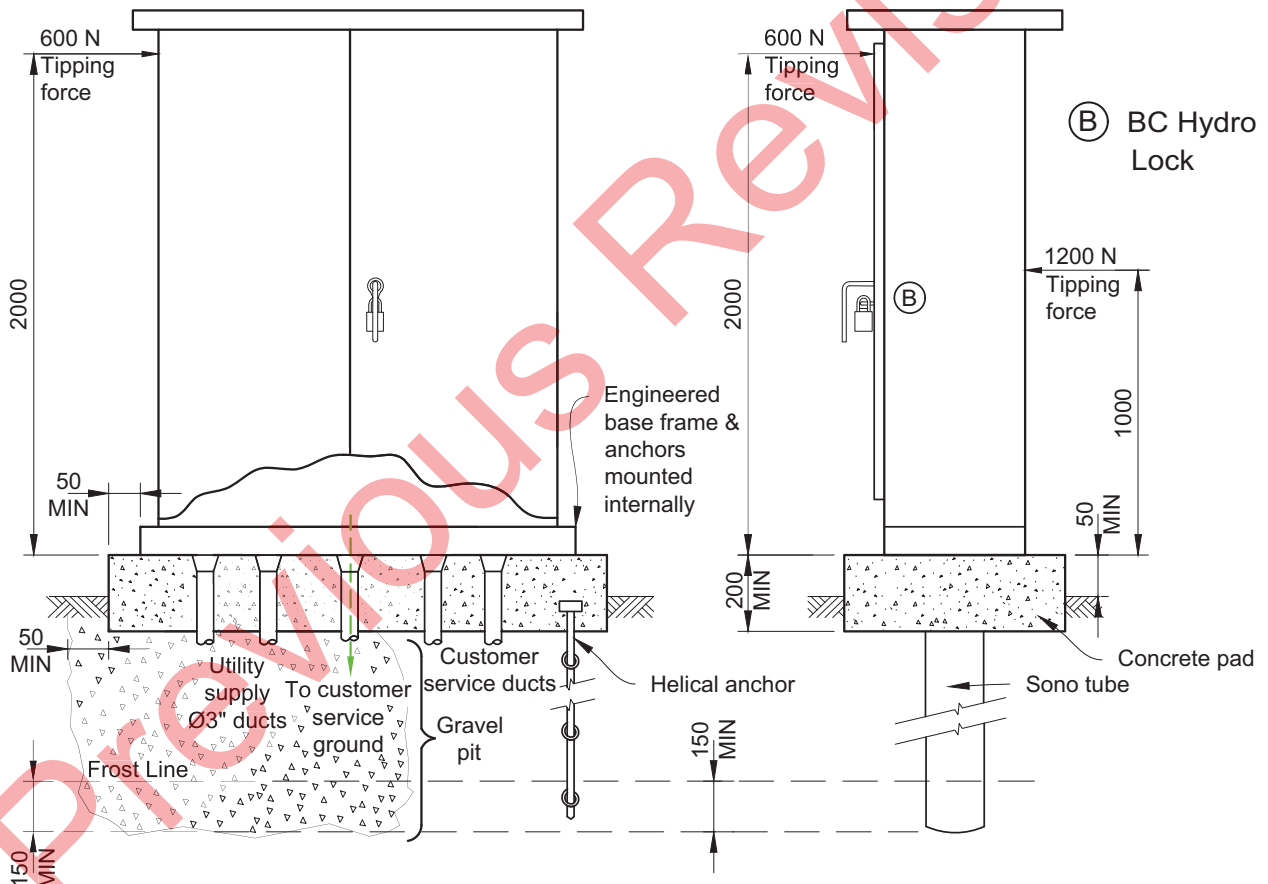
200 A to 600 A kiosk, concrete pad and duct installation
